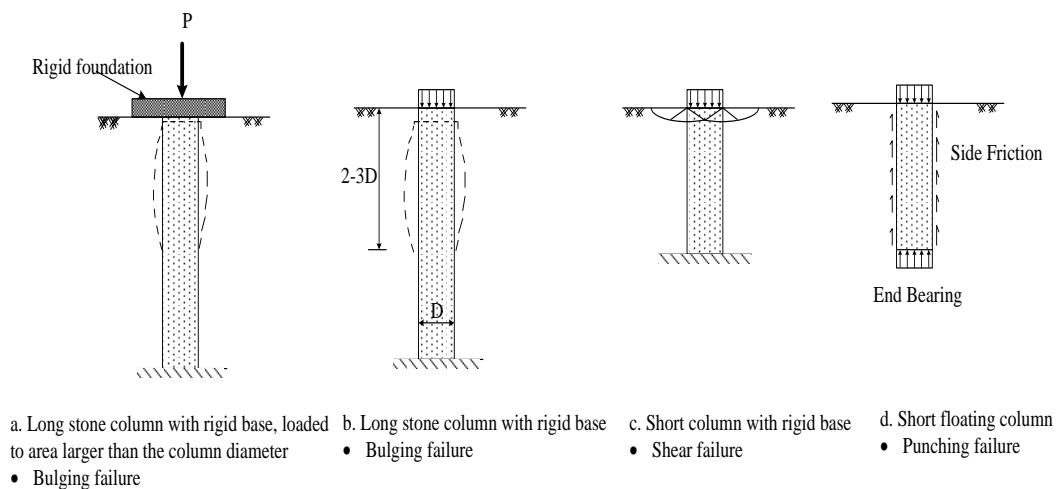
Failure mechanism of single stone column (Barksdale and Bachus, 1983)
